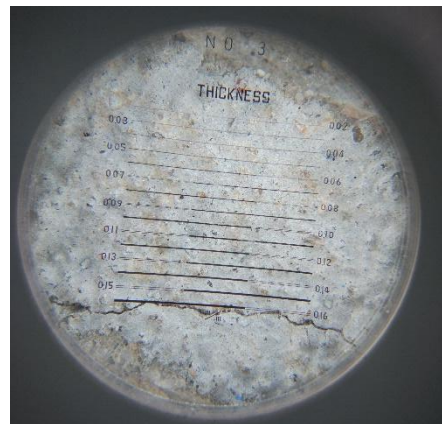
Transverse Deck Crack at the Middle of Mid-span, Ramp 21
